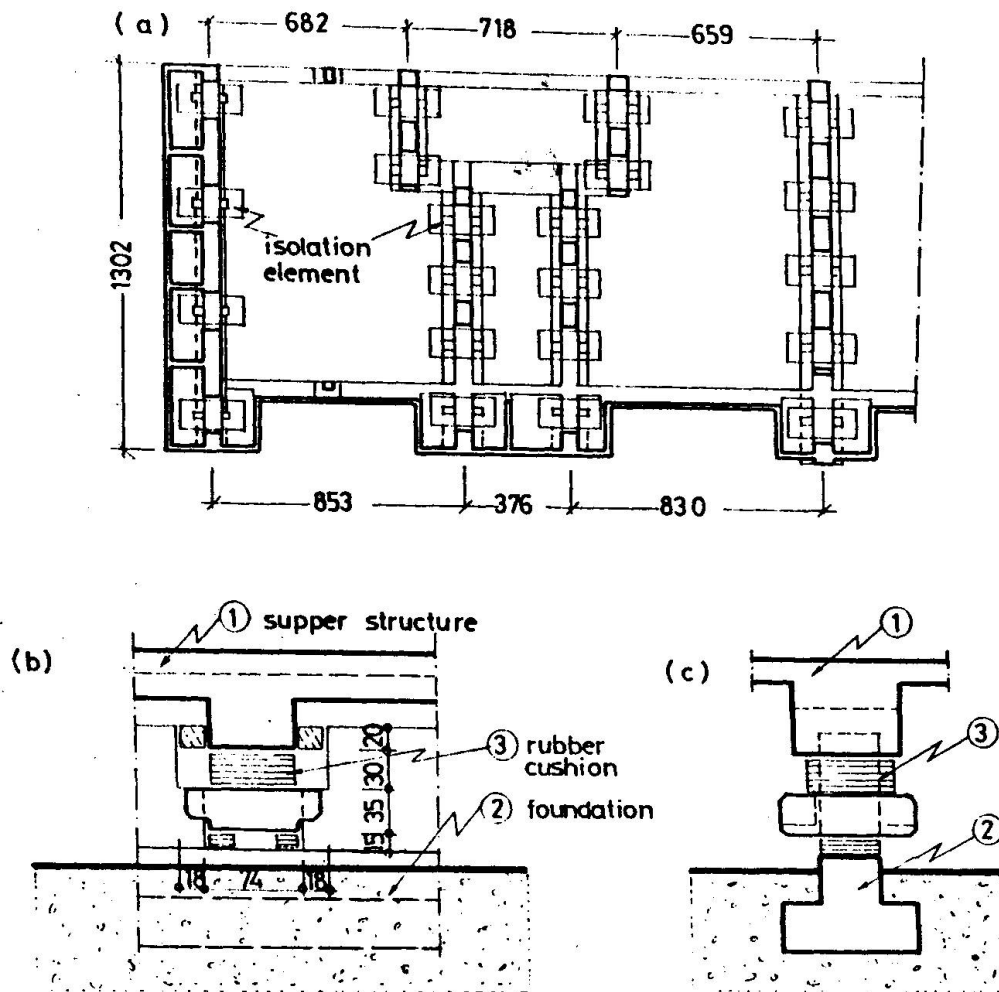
(a) Partial foundation plan with position of rubber cushions
